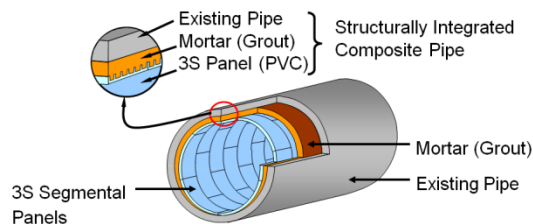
Segmental lining can create a structurally integrated composite pipe consisting of the existing pipe, high strength grout and panels (Kampbell, 2009)
